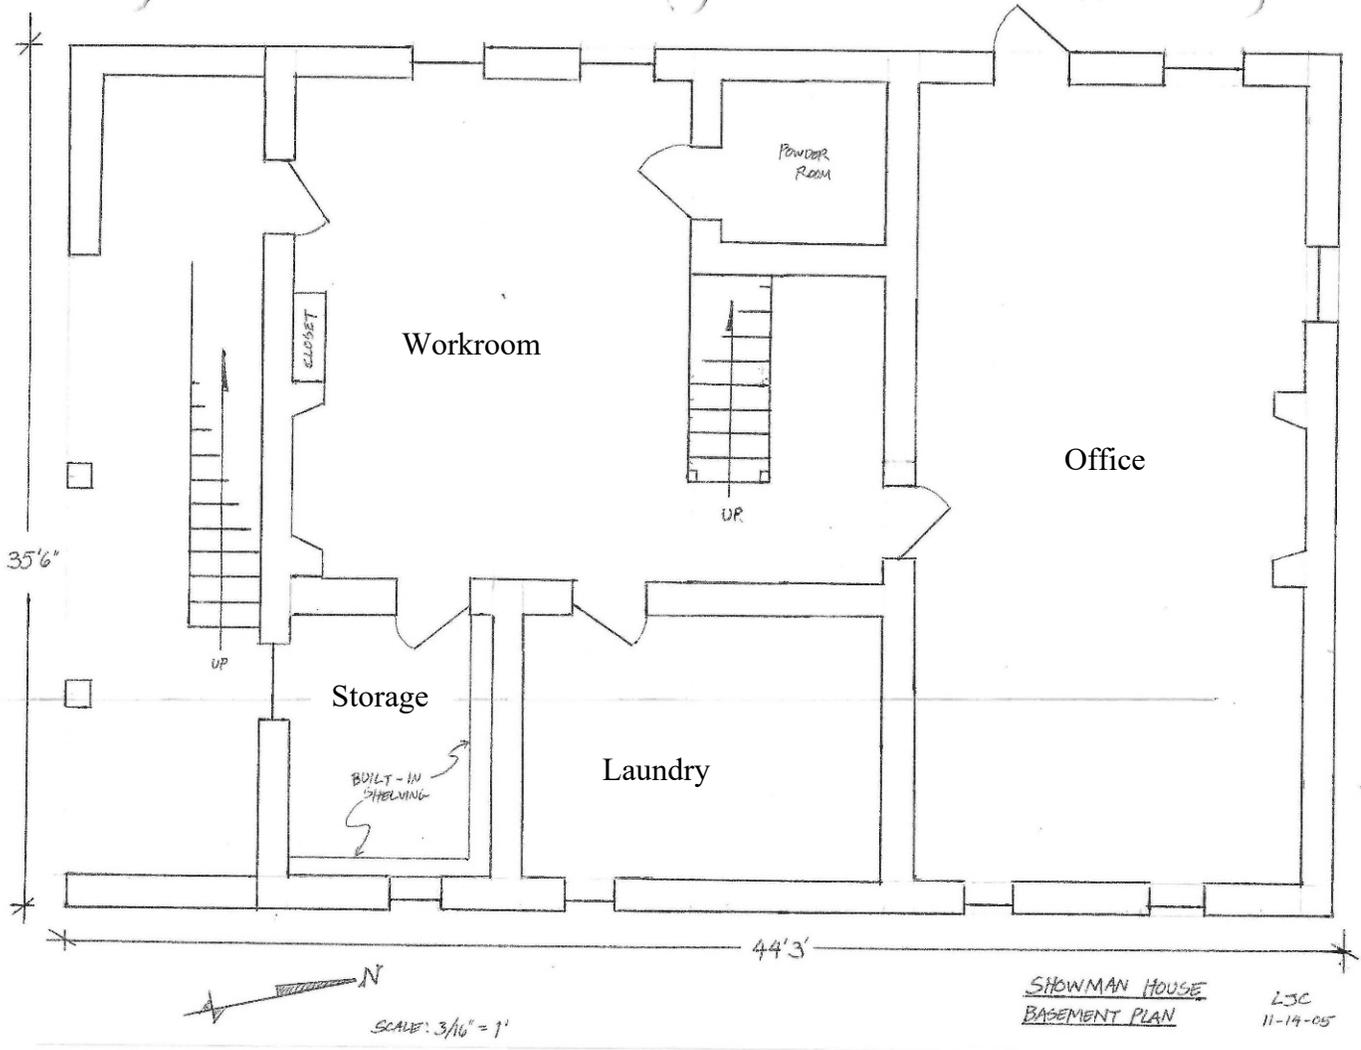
Basement floor plan of house. Antietam Farm house plans courtesy of Leslie Clark.
